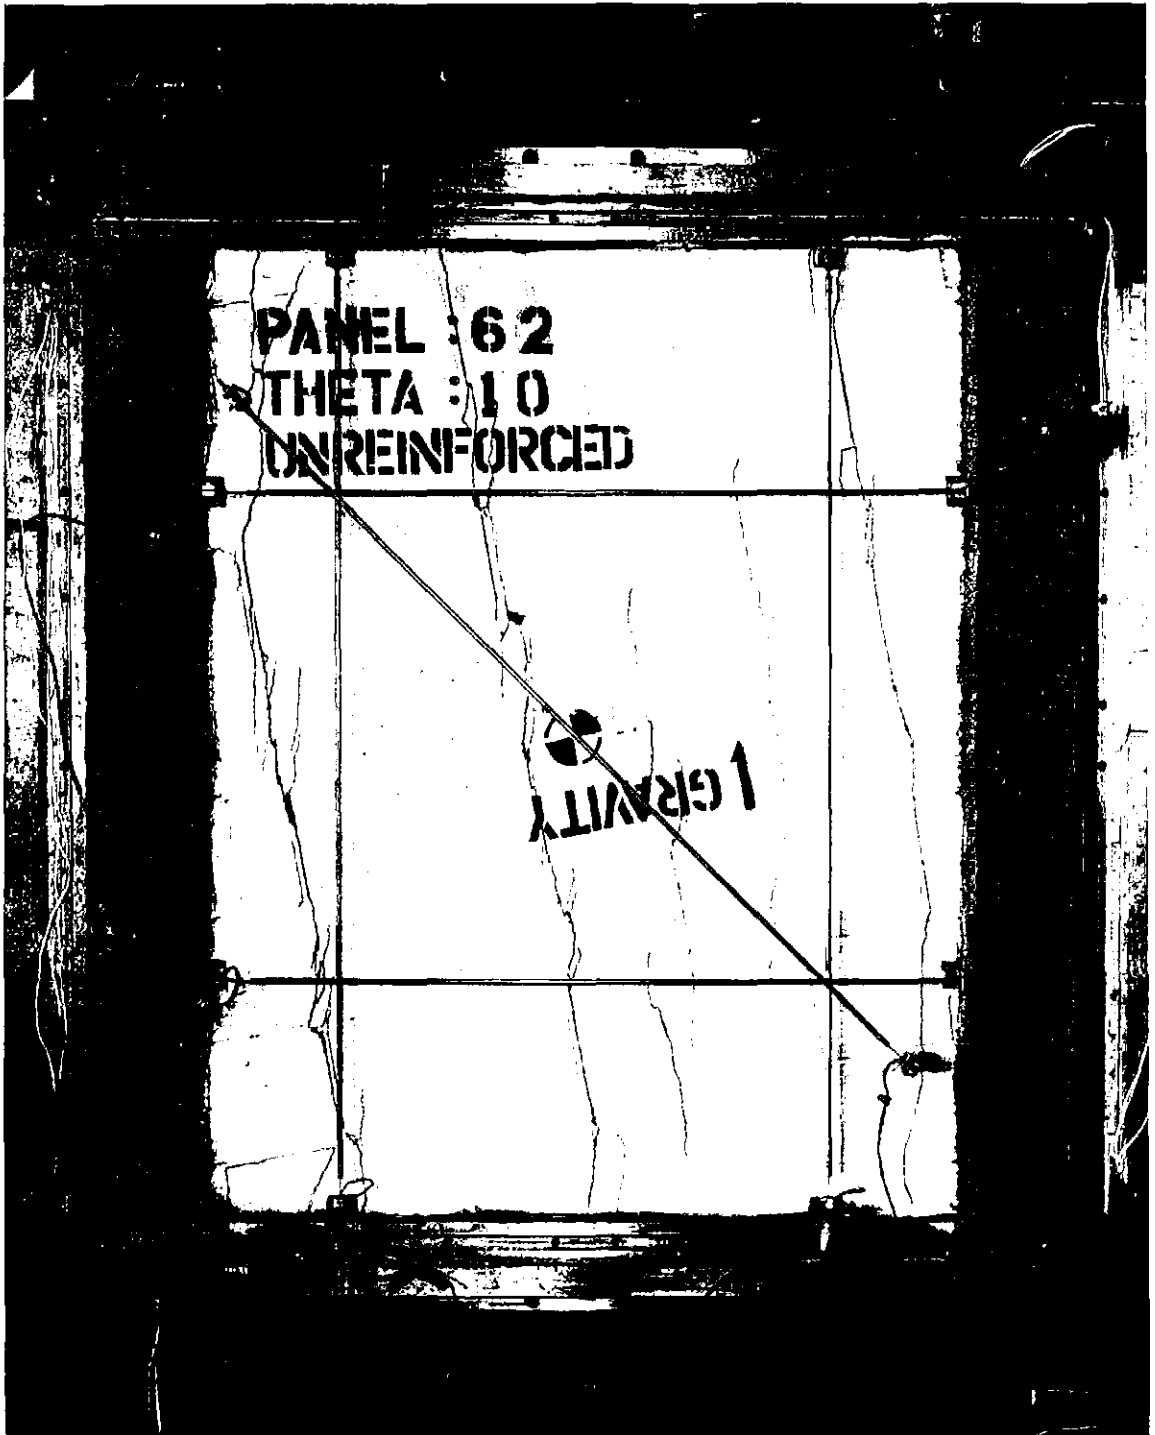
Load Distribution Fixtures Bonded to Specimen
